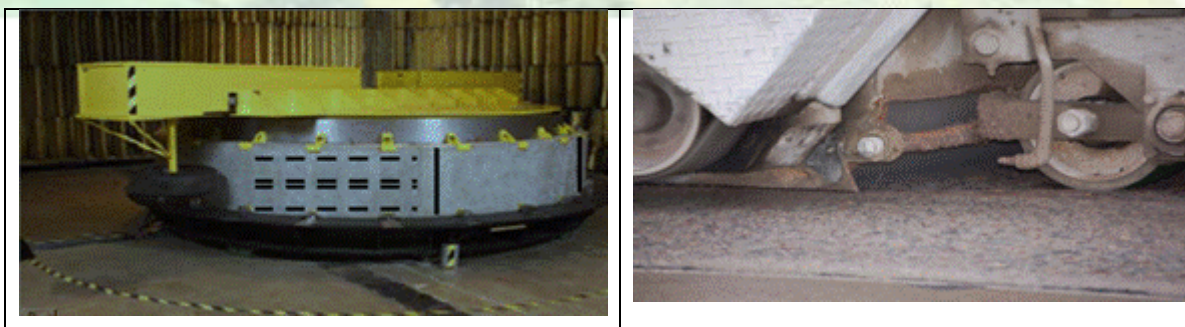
Purdue SQDH Laboratory Test Wheel & Diamond Grinding Equipment.
